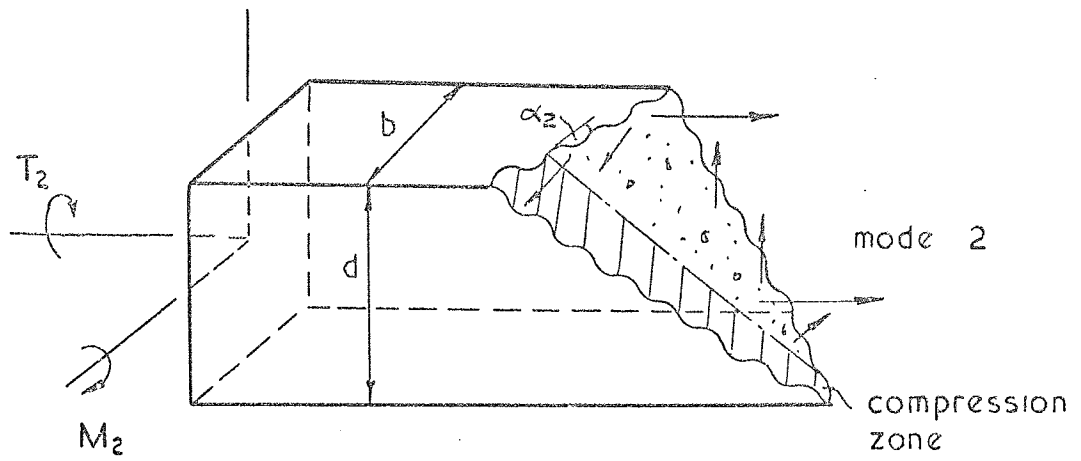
Mode 2 type of failure for concrete members reinforced longitudinally and transversely.
